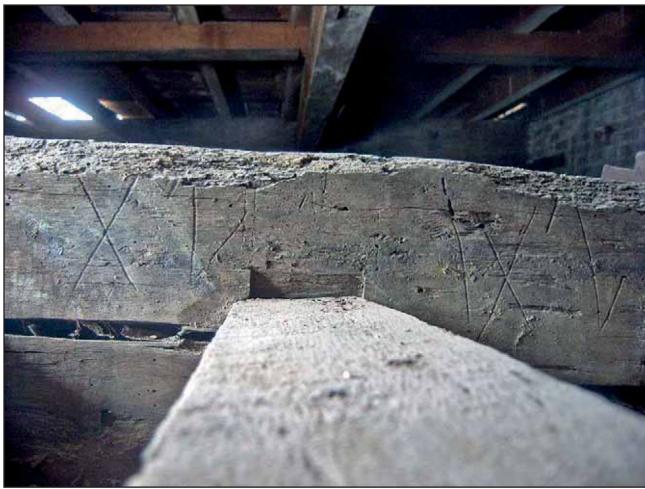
View from above of the Upper and Lower structures of the Flat Roof
